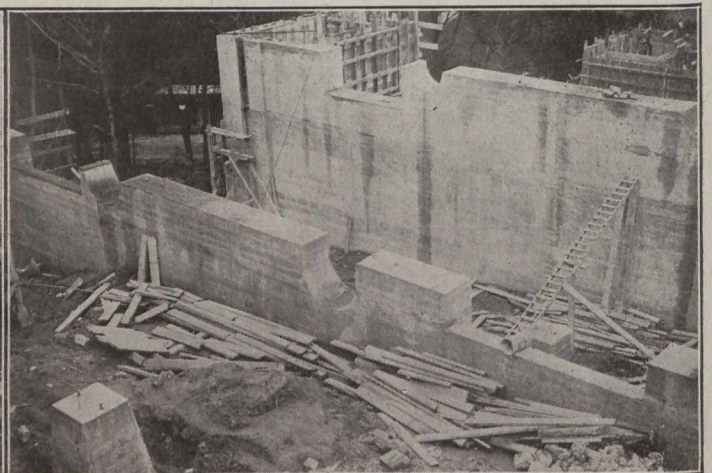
West Approach, Rosedale Section, Showing Provision for Future Lower Deck, Water Mains, Etc.
